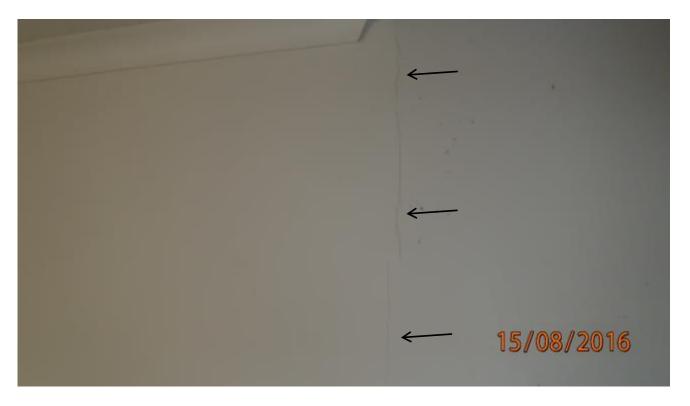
shows hairline radial cracking to the painted cement rendered wall extending from the left hand side of the window head in the Kitchen.
